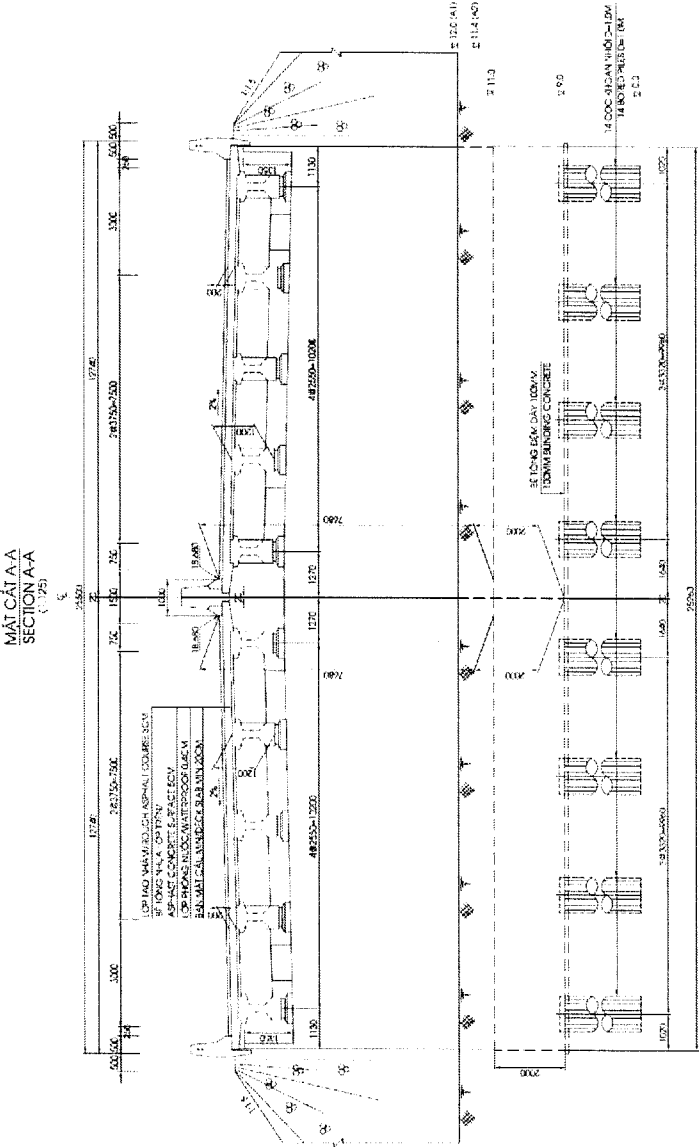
Bridge Cross Sections (ORB13, 2/2)
